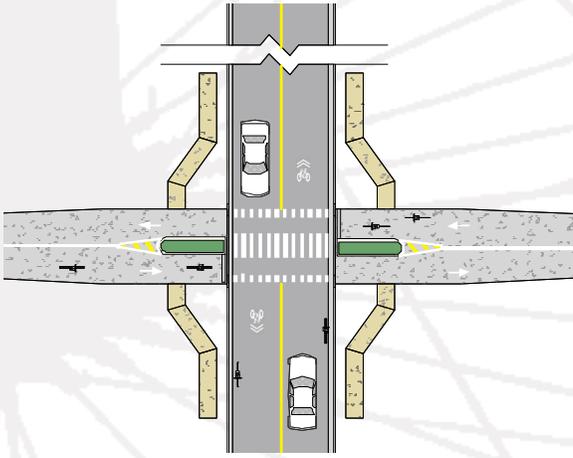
Detail (left) and photo (above) showing Midblock Crossing with Shared Use Path.
